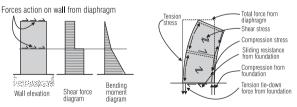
Forces acting on shear wall Figure 29. Forces acting within shear wall
